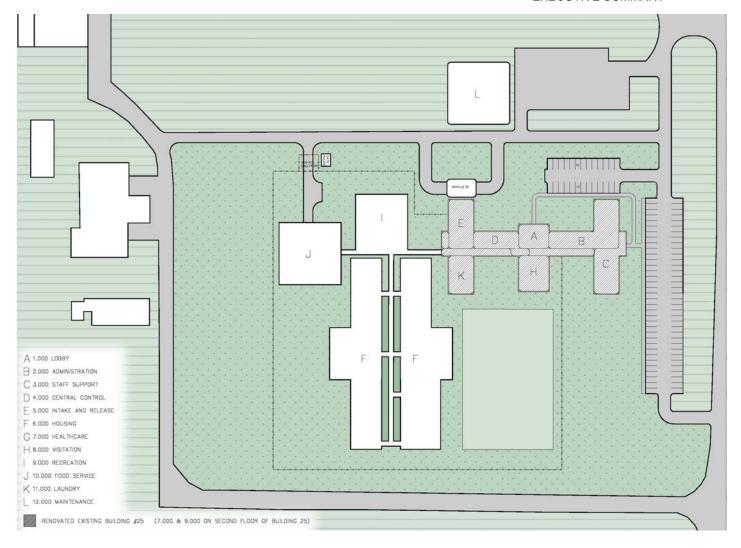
, RENOVATION OF BUILDING #25 WITH ADDITION
